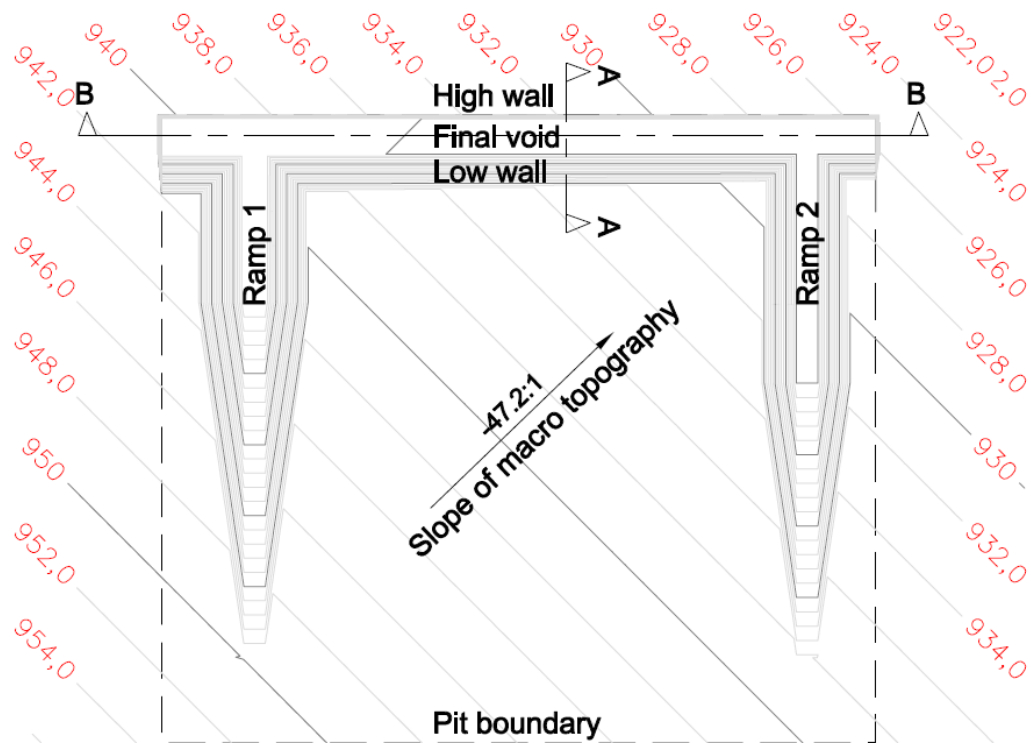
Typical reconstructed geometric model of an opencast pit layout
